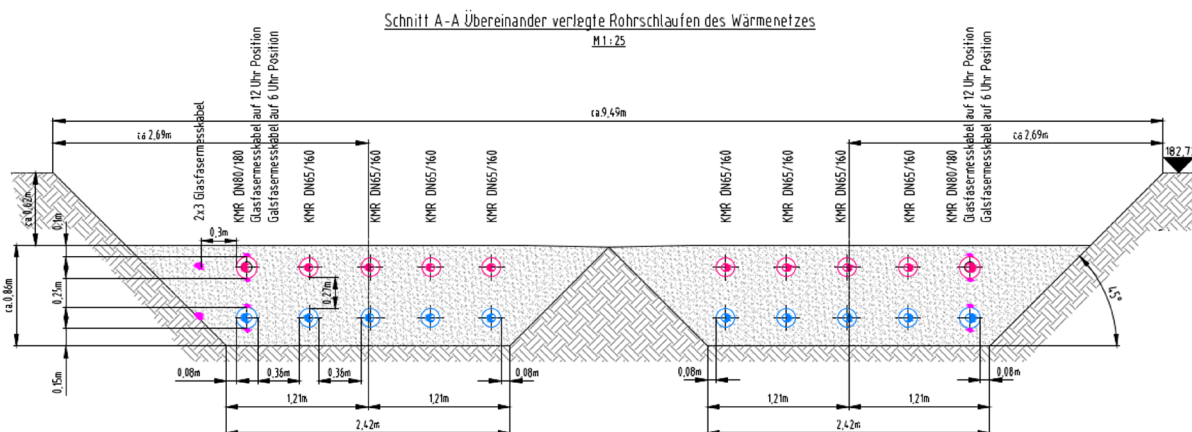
Cross-section of the flexible test grid and route of the fibre-optic measuring cable on the outer pipes
